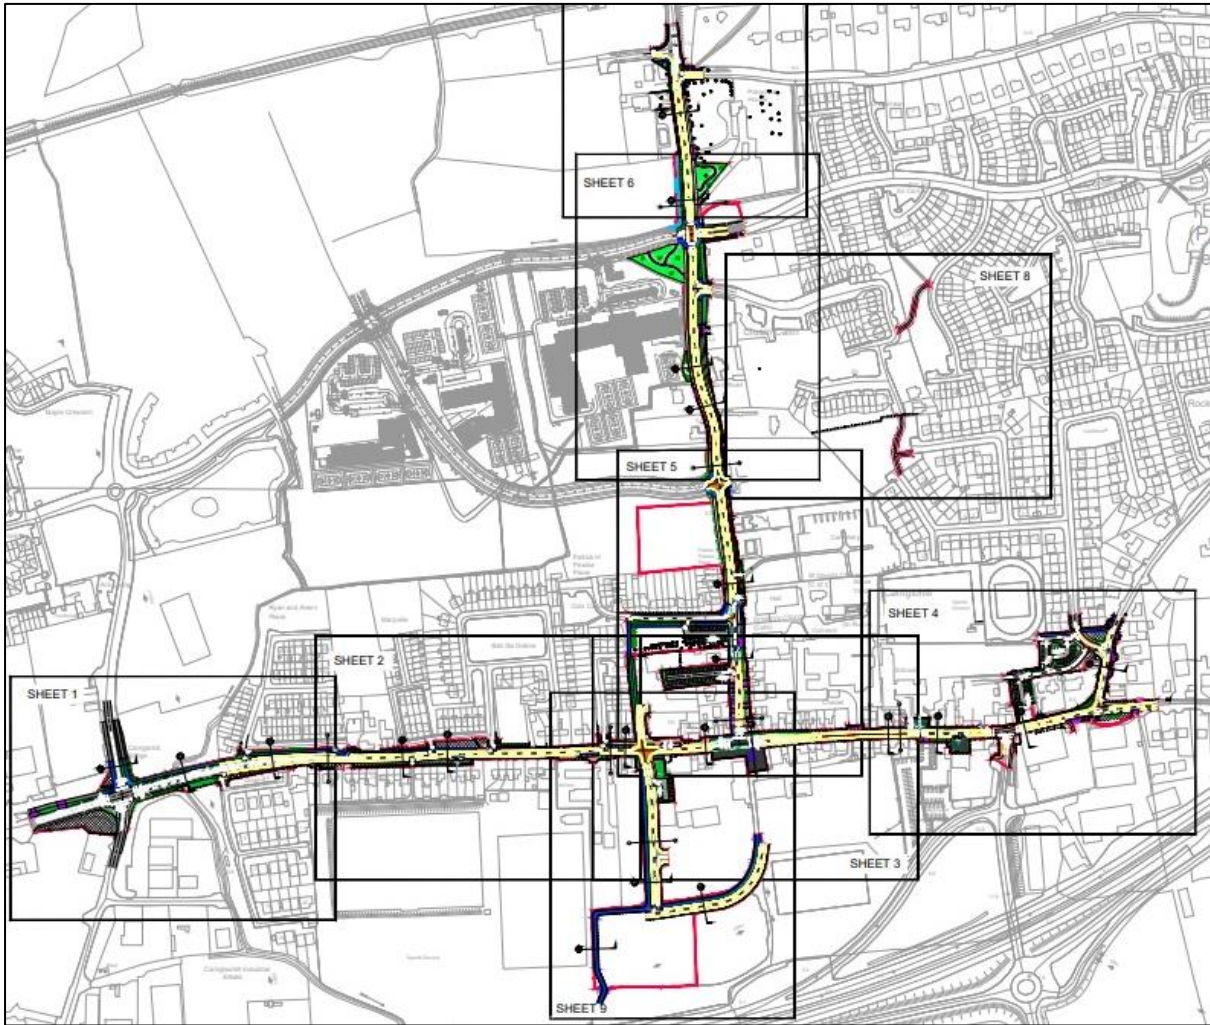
Proposed Main Street and Station Road Carrigtwohill URDF Public Realm Infrastructure Works
